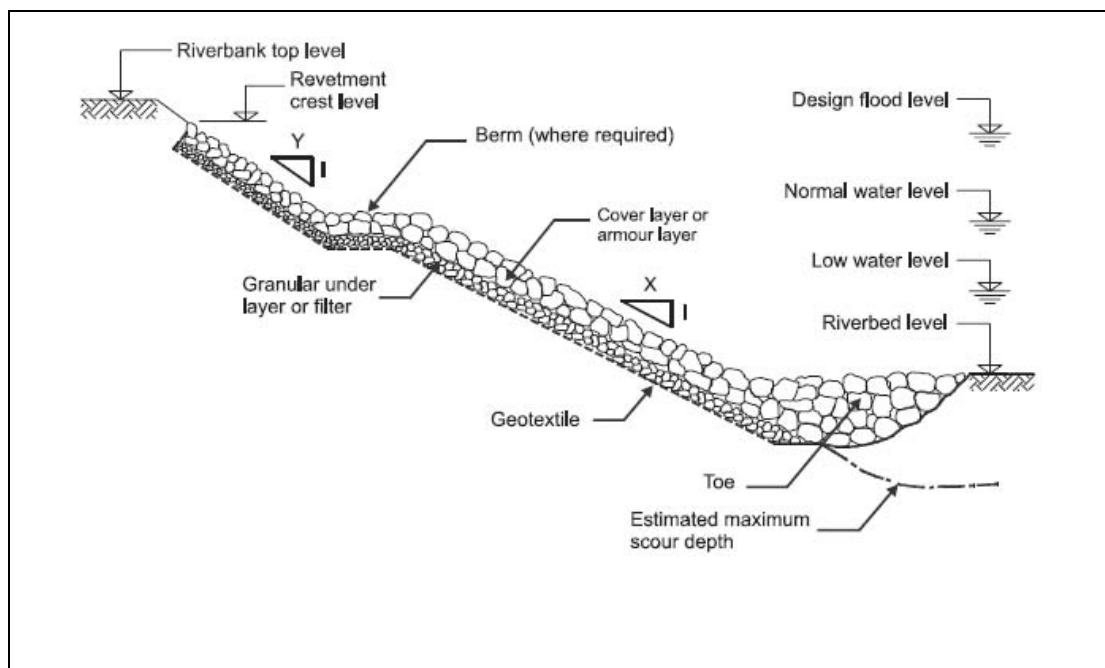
Typical cross-section of revetment for riverbank protection (CUR Rock Manual, 2008)
